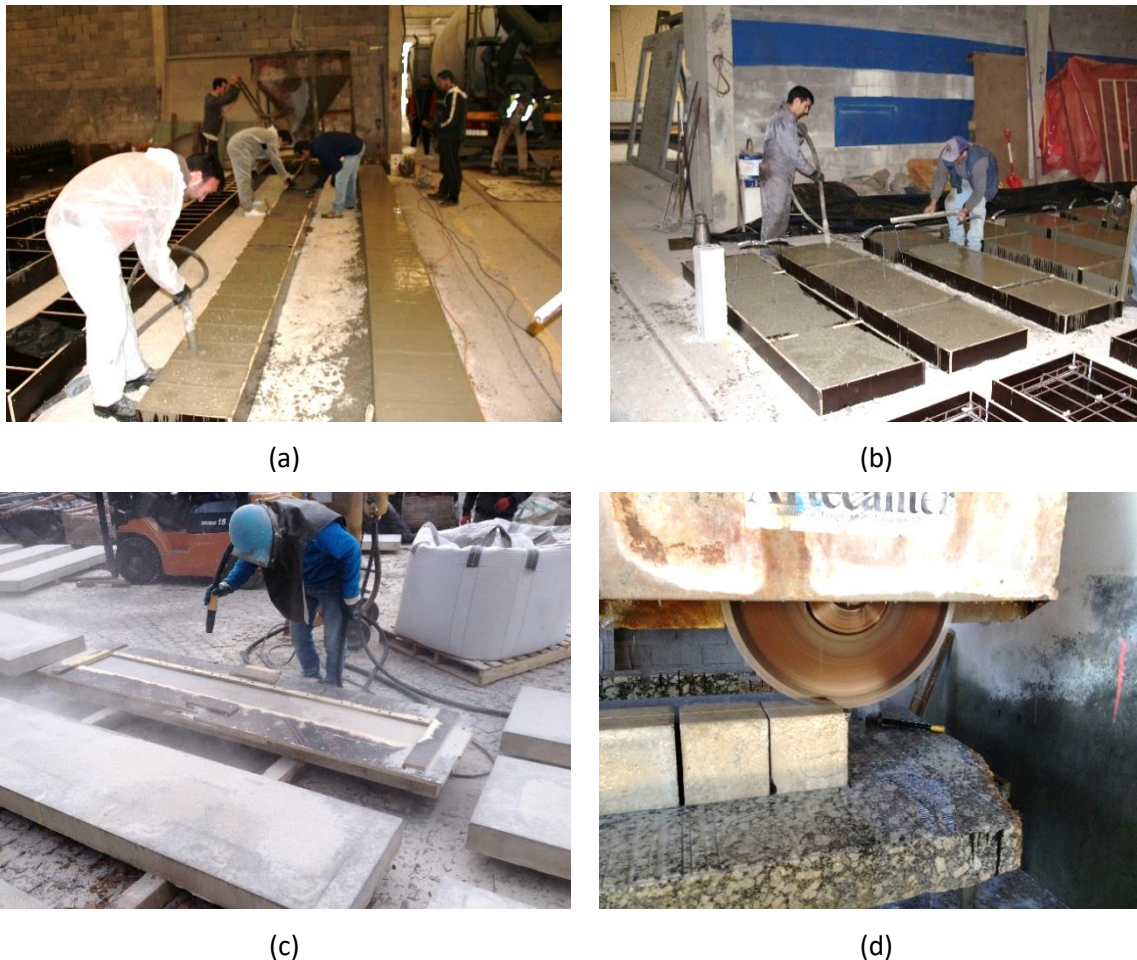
Main steps on the production and preparation of the specimens (concrete): (a) casting of bond concrete substates; (b) casting of RC slabs; (c) sandblasting of the concrete surface for EBR specimens and, (d) grooves' opening for NSM specimens.
